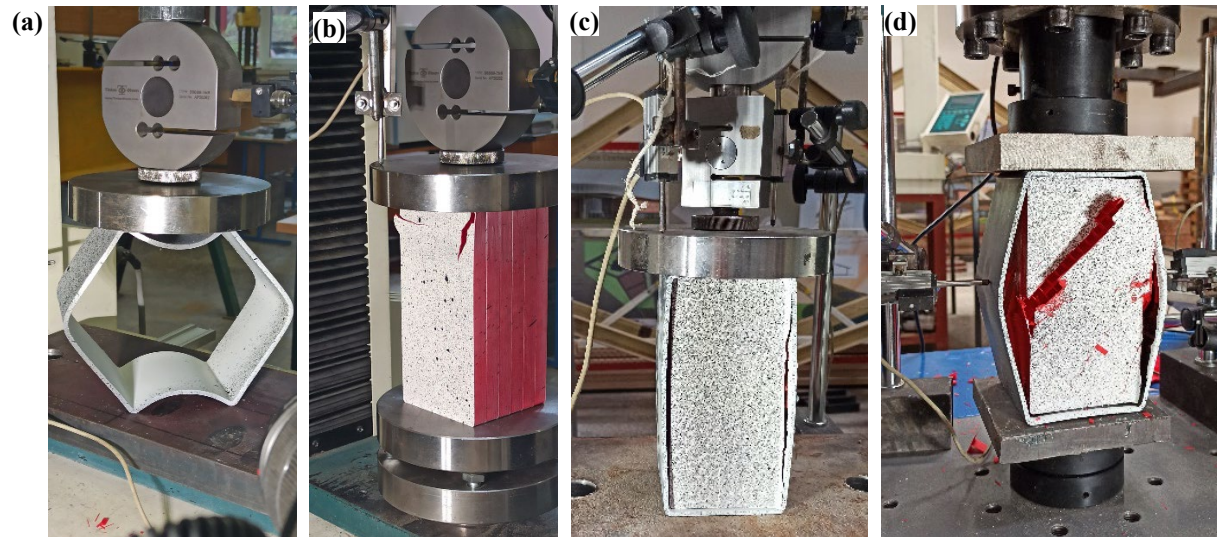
Compression tests: (a) test apparatus; (b) strengthened sample; (c) a typical failure; (d) a failure of the composite section
